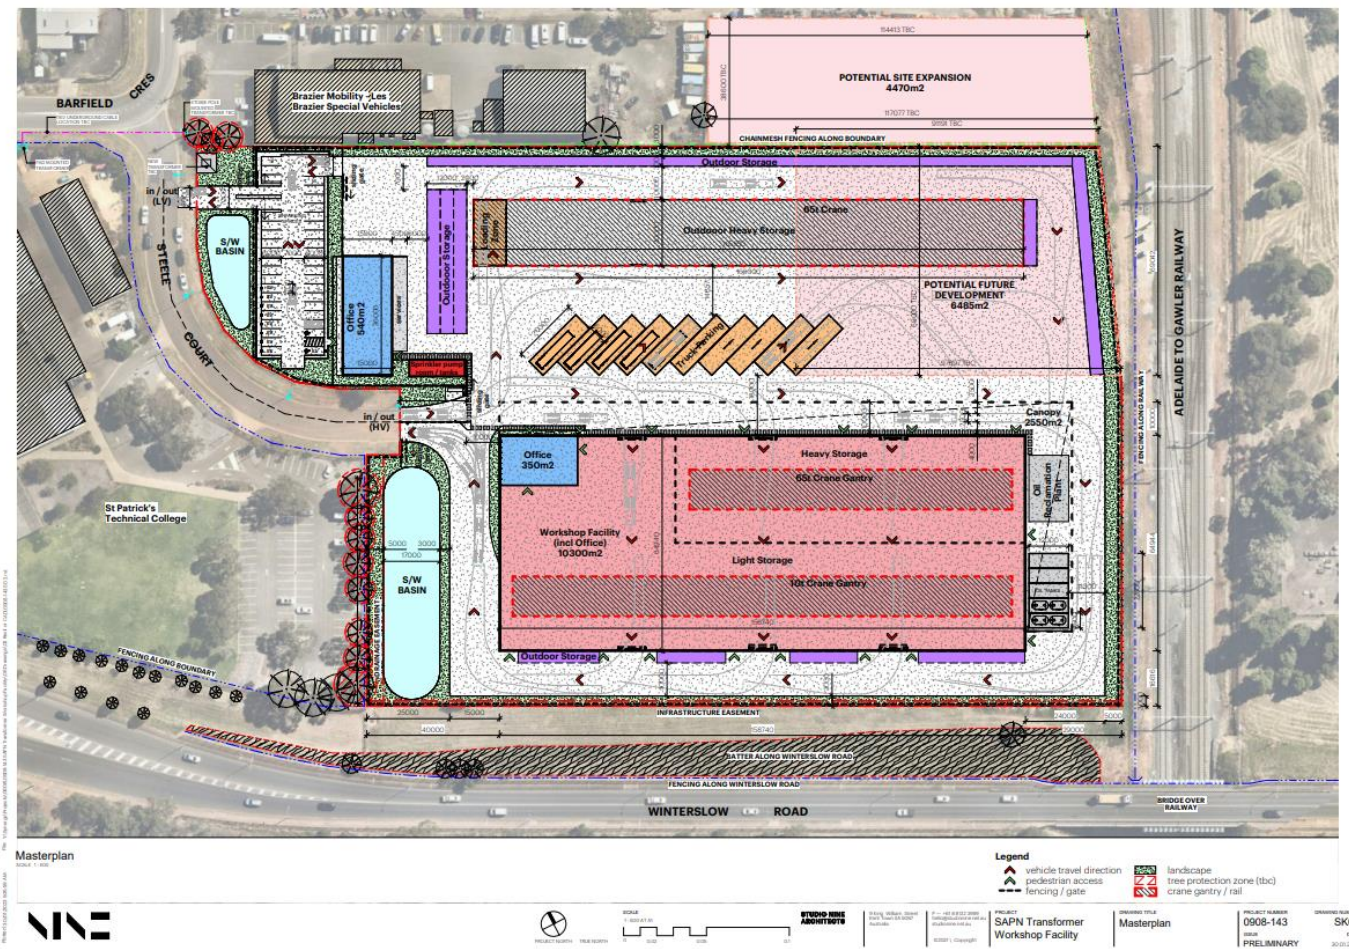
Concept Masterplan for the new Transformer Workshop and Storage Facility – Recommended Option
